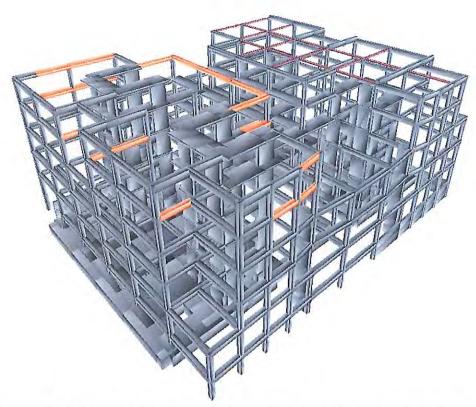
Elements that exceed SLS2 limits (55 % DBE) - View from Southeast Corner
